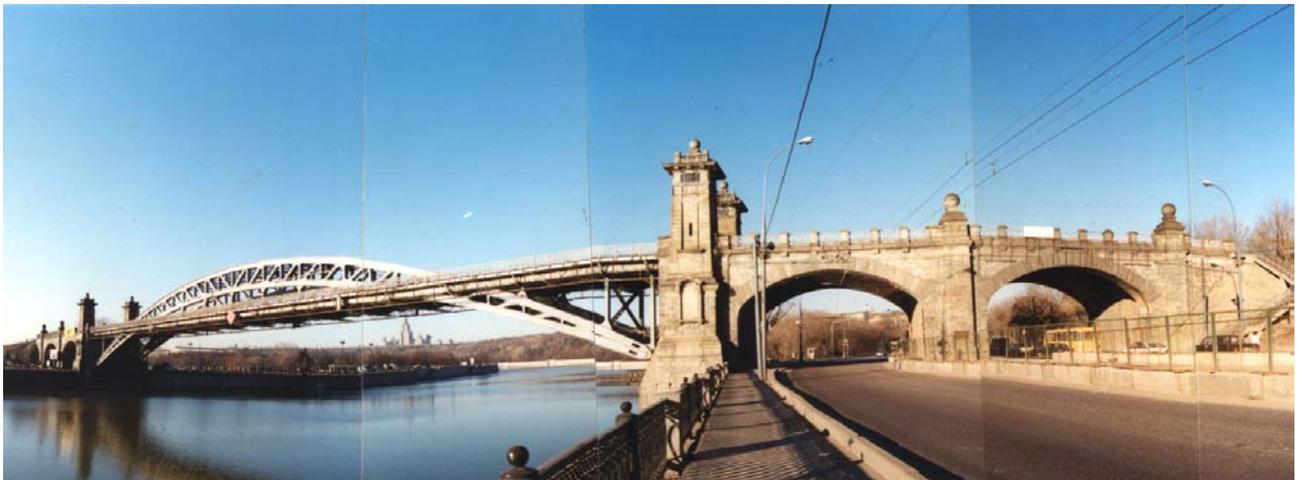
Andreevsky railroad bridge was built in 1903-1905 crossed the Moskva River with a shallow half-through steel arch spanning 135 m. Nowadays it was replaced with two new bridges: one of the railroad, another road bridge.
